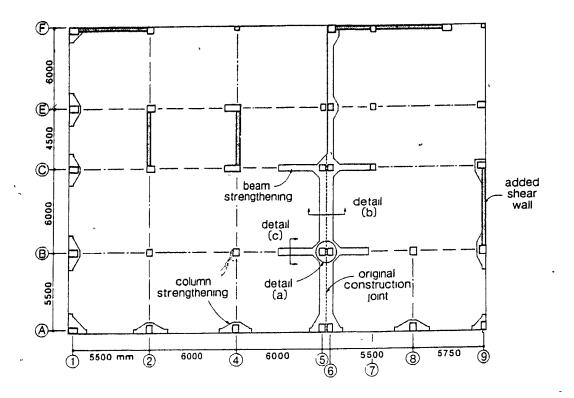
Plan View of Nine-Storey Structure at 88 Liverpool (see details in Fig. 3.15).
